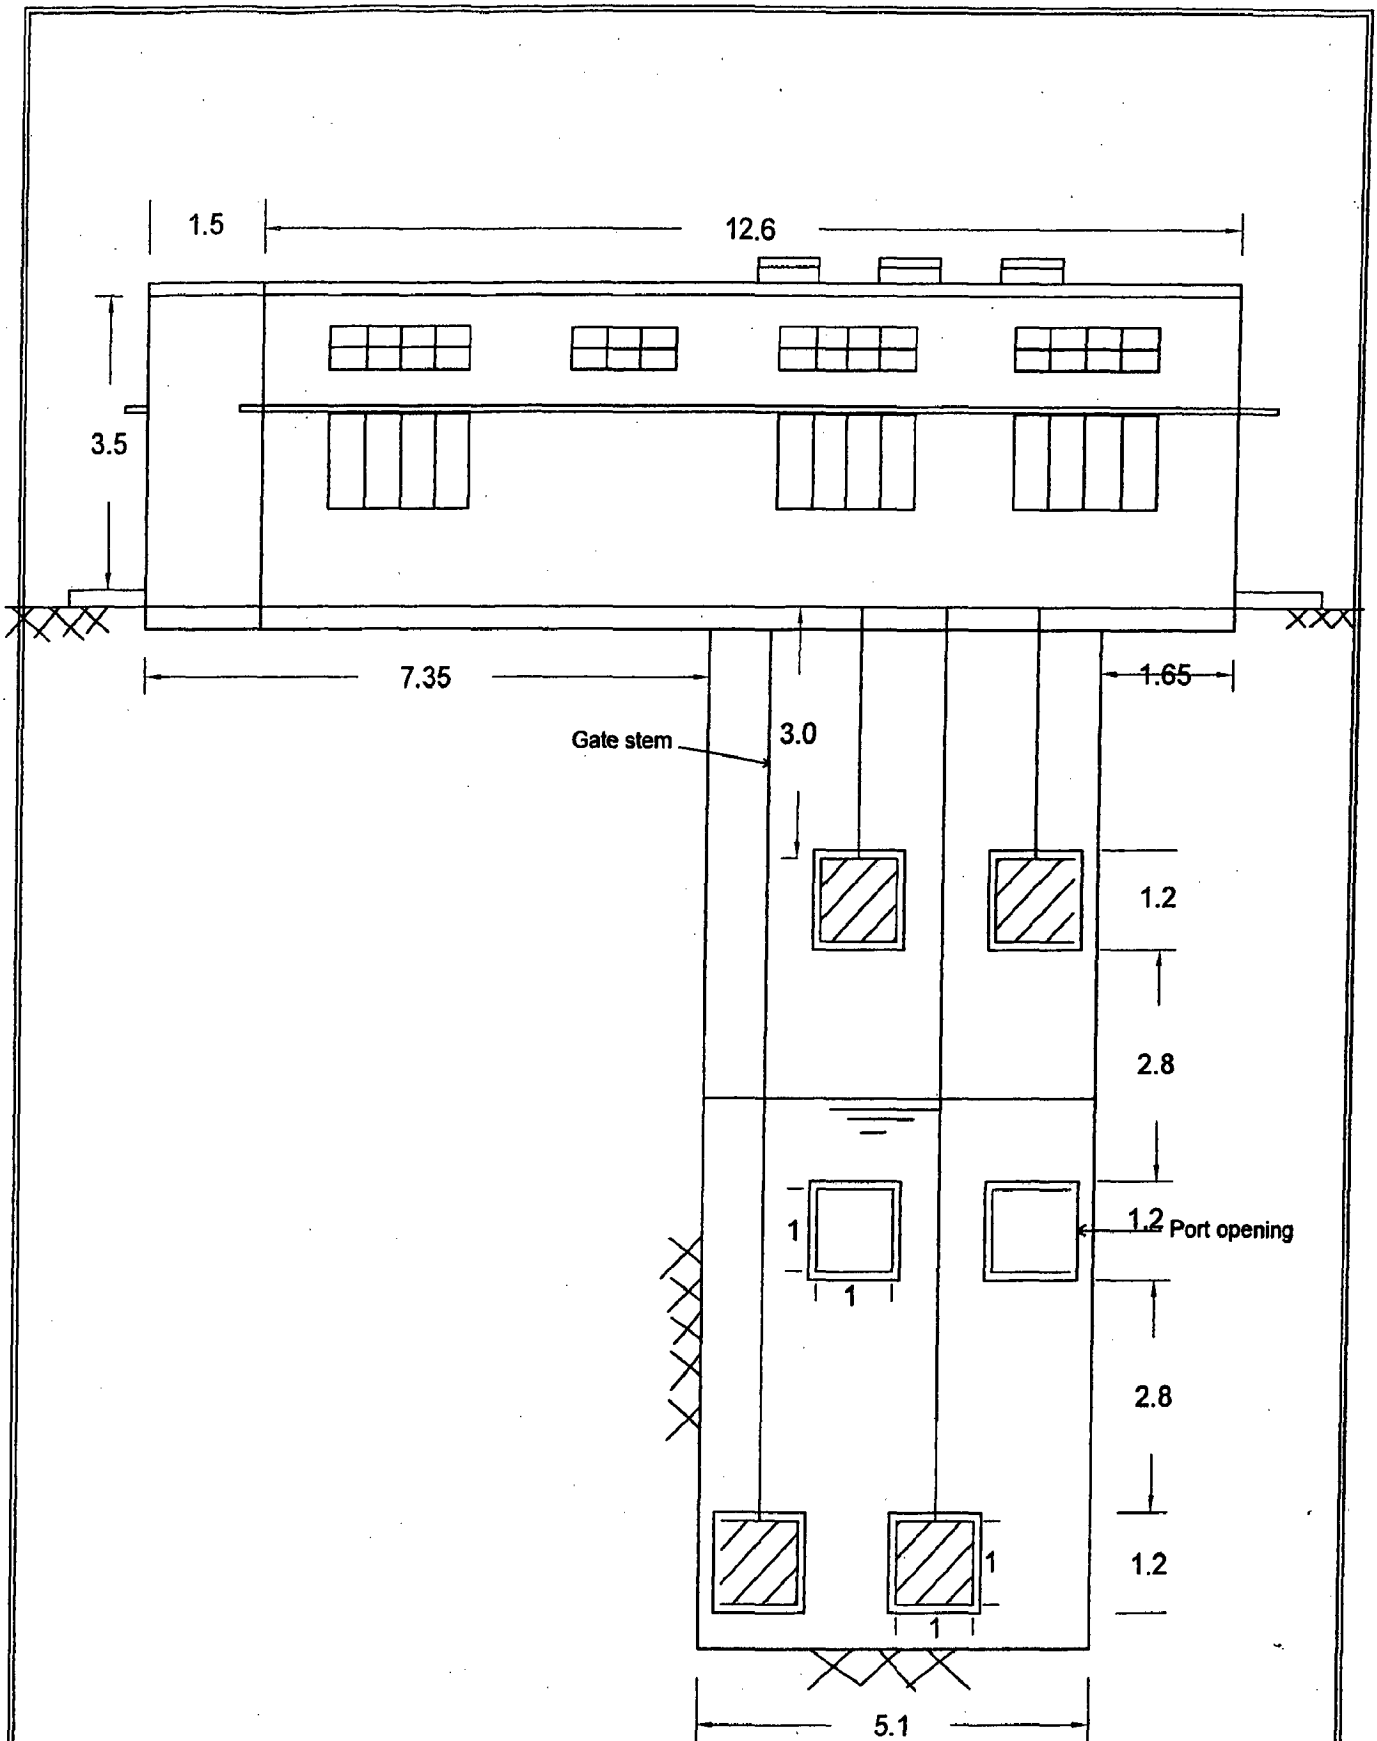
(b) FRONT VIEW OF JACKWELL INTAKE
